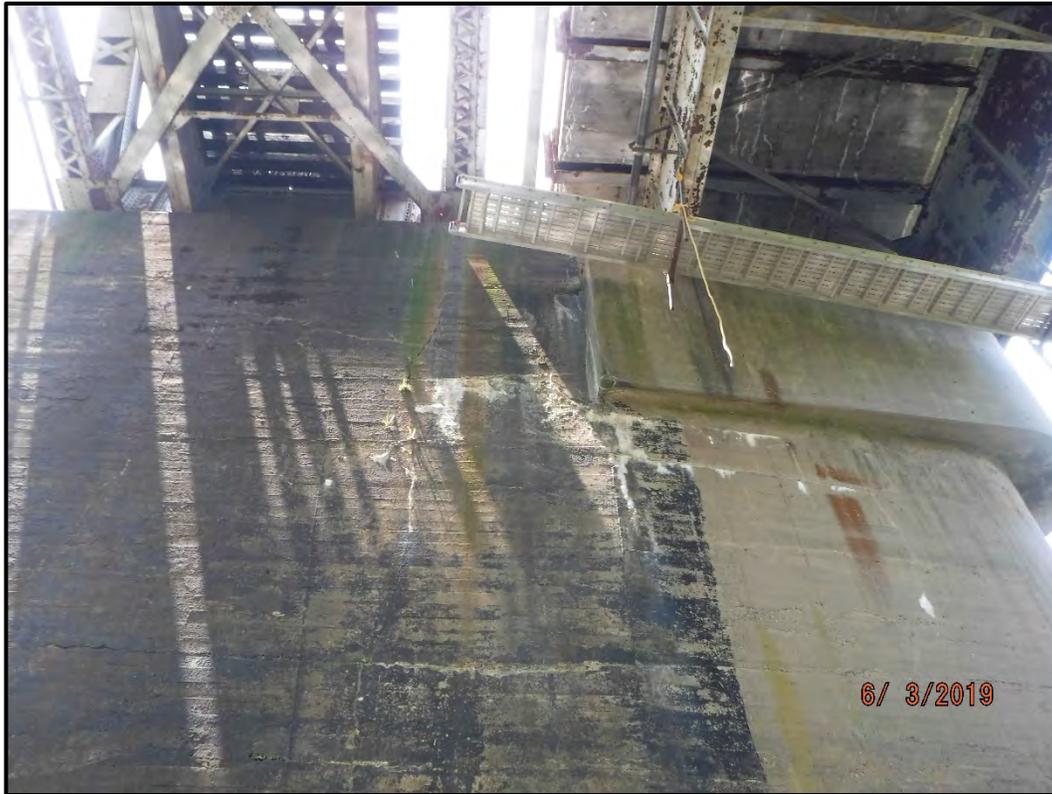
Close-up of the cracking with heavy efflorescence on the east face of Pier 4 under the pier cap. Notice the horizontal cracking is consistent with the masonry joints that are encased in concrete.
